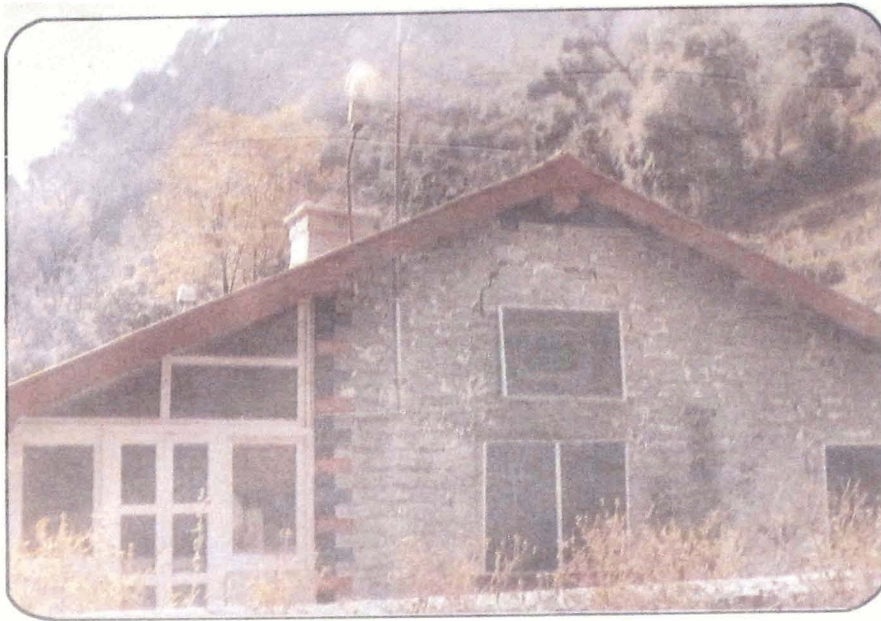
Bulging and cracking around the ventilator and partial collapse of the gable portion of the PWD Rest house, Gaurikund.
